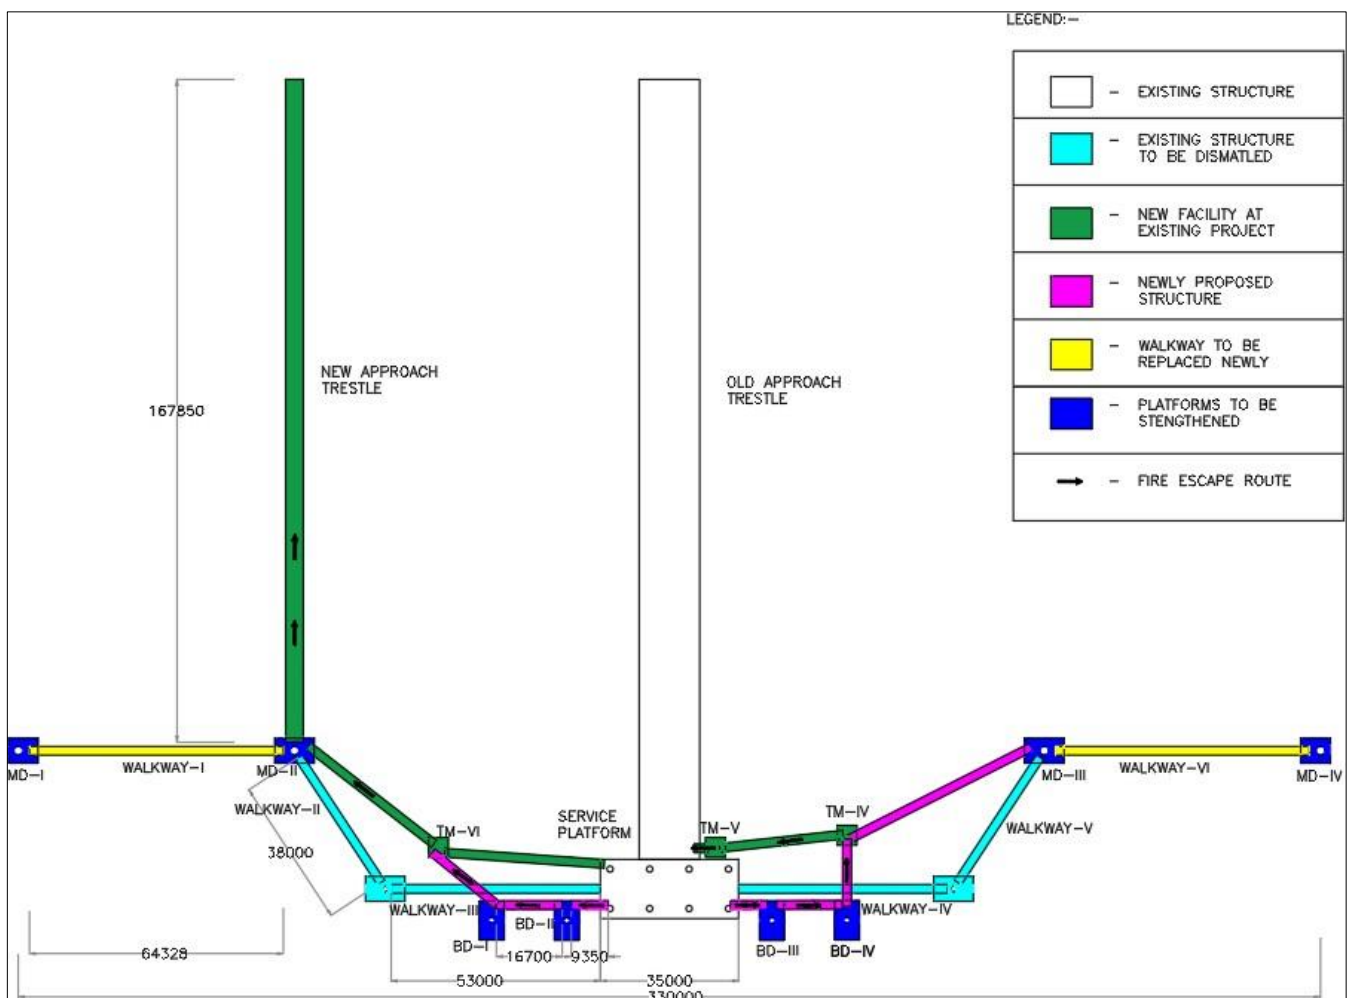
General arrangement Drawing (Dimensions are tentative)
